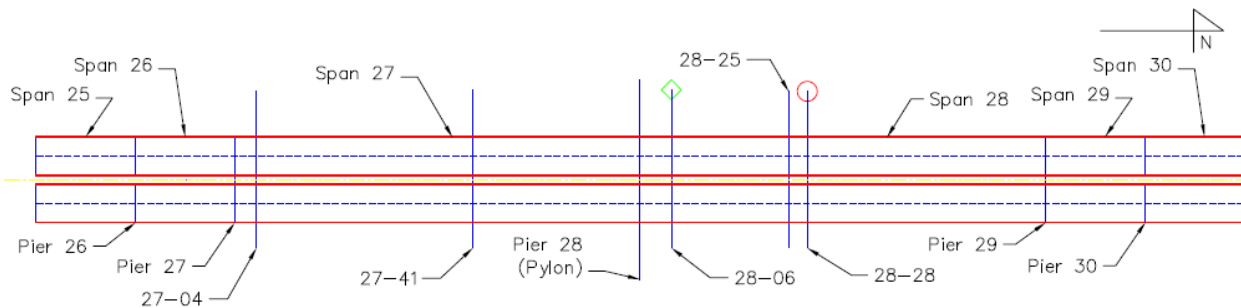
Mainspan of Bridge, Plus Span 25 and Span 30
